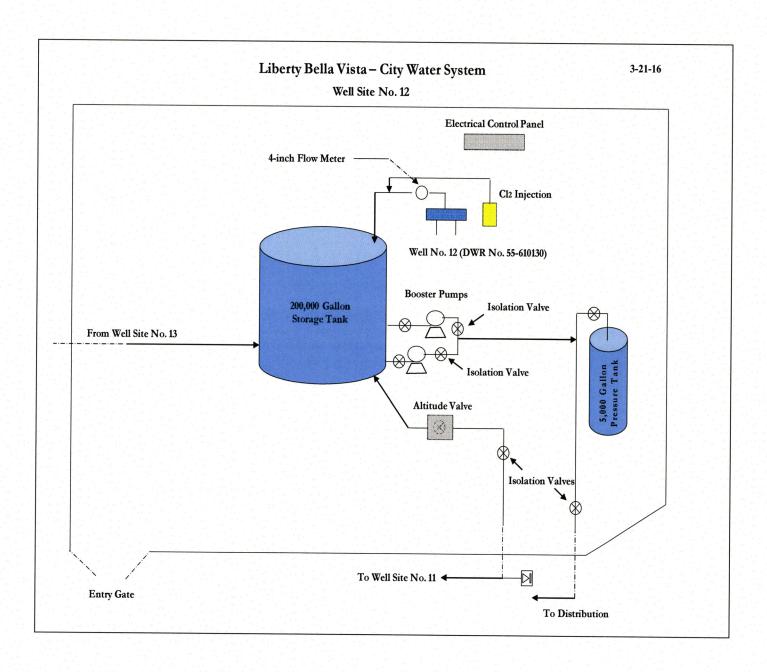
CITY WATER SYSTEM WELL SITE NO. 12
